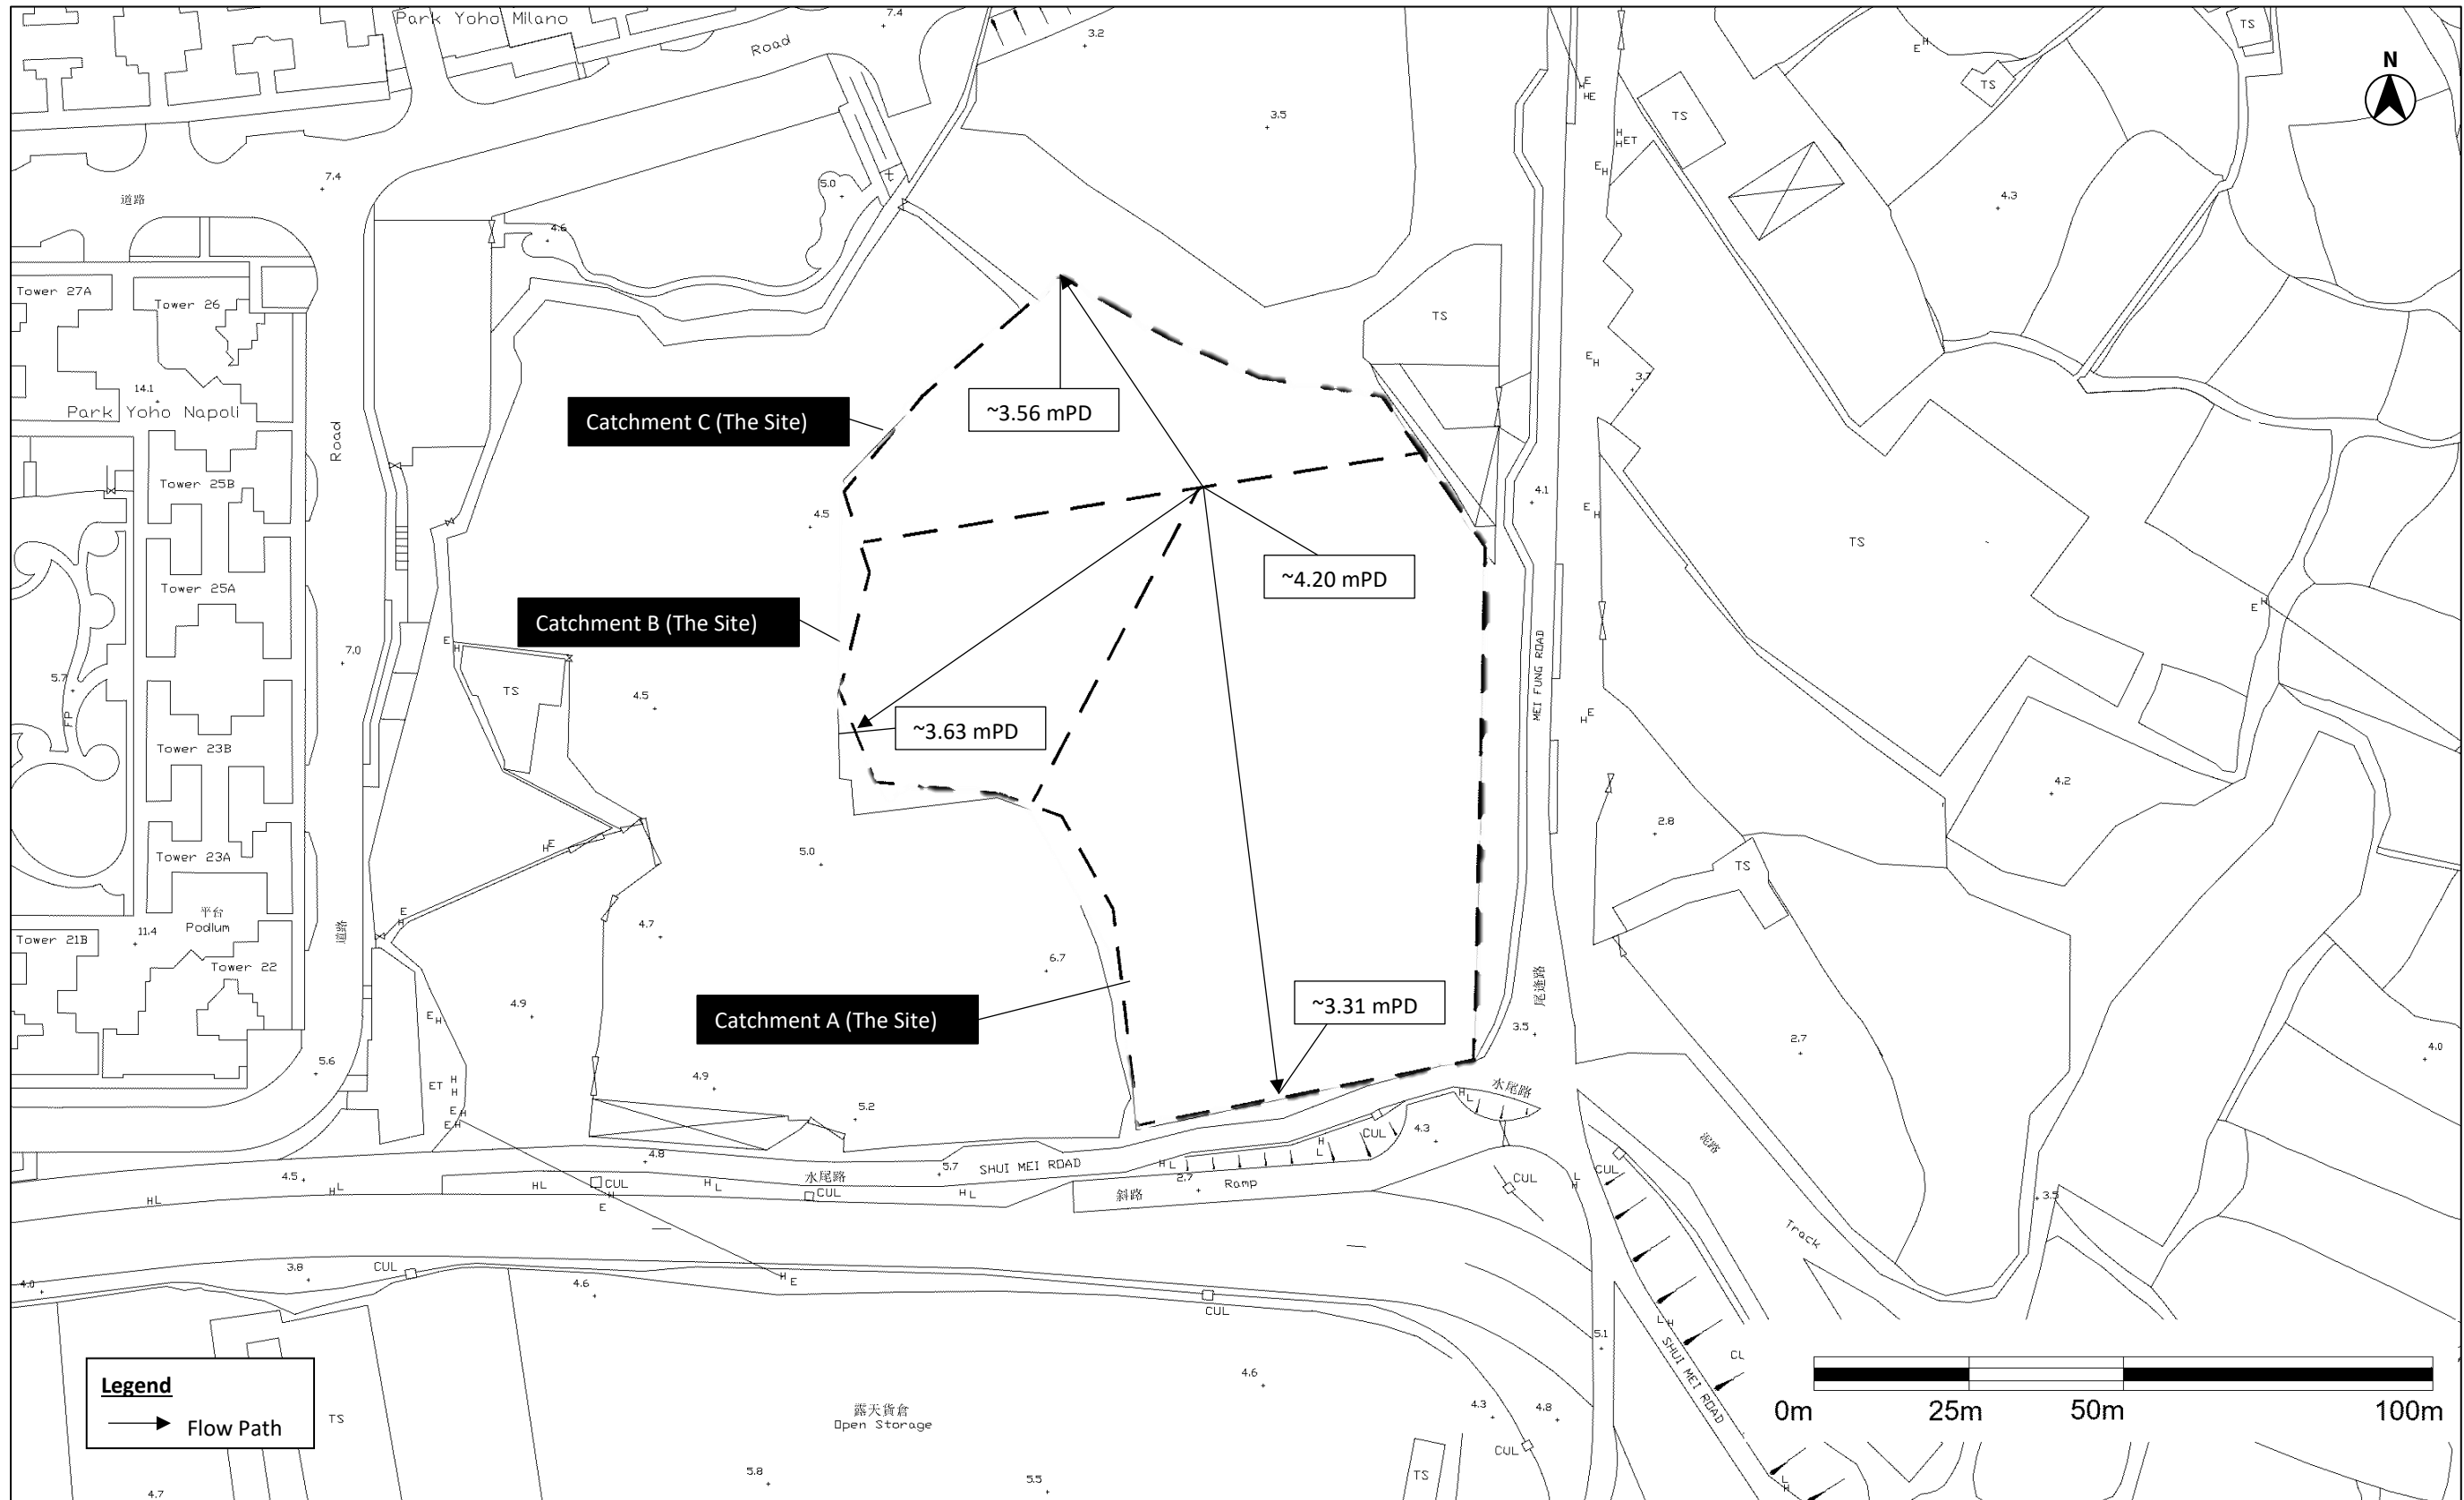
Indicative Proposed Drainage Diversion Layout
